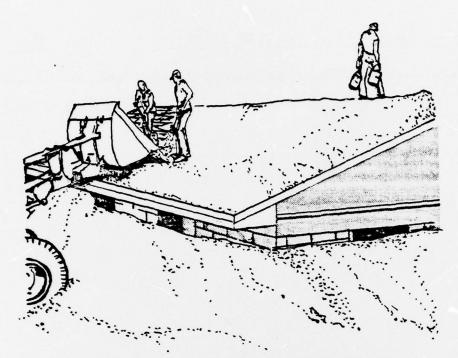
PLACING SOIL ON SLOPED ROOF.
